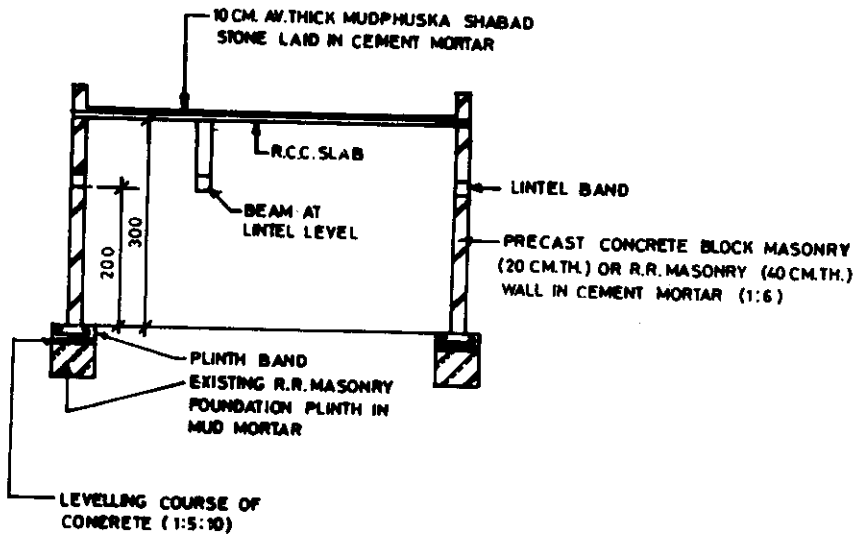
RECONSTRUCTION OF HOUSE ABOVE PLINTH LEVEL (PLAN)
